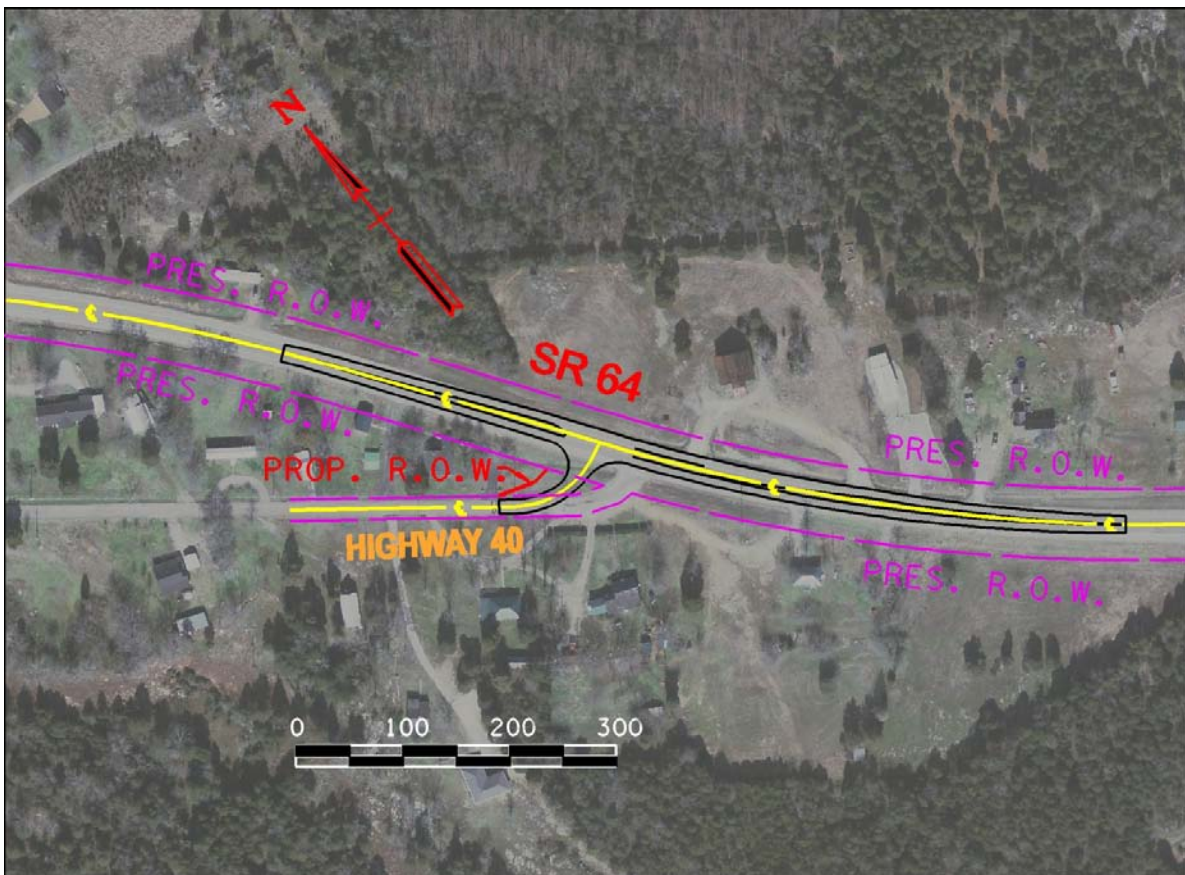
Plan View of Center Turn Lane at Highway 40 Intersection
